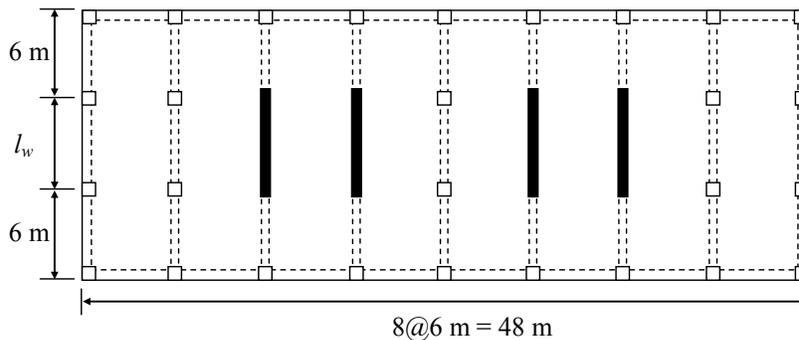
Plan view of bare frame configuration of the prototype frame wall structure
